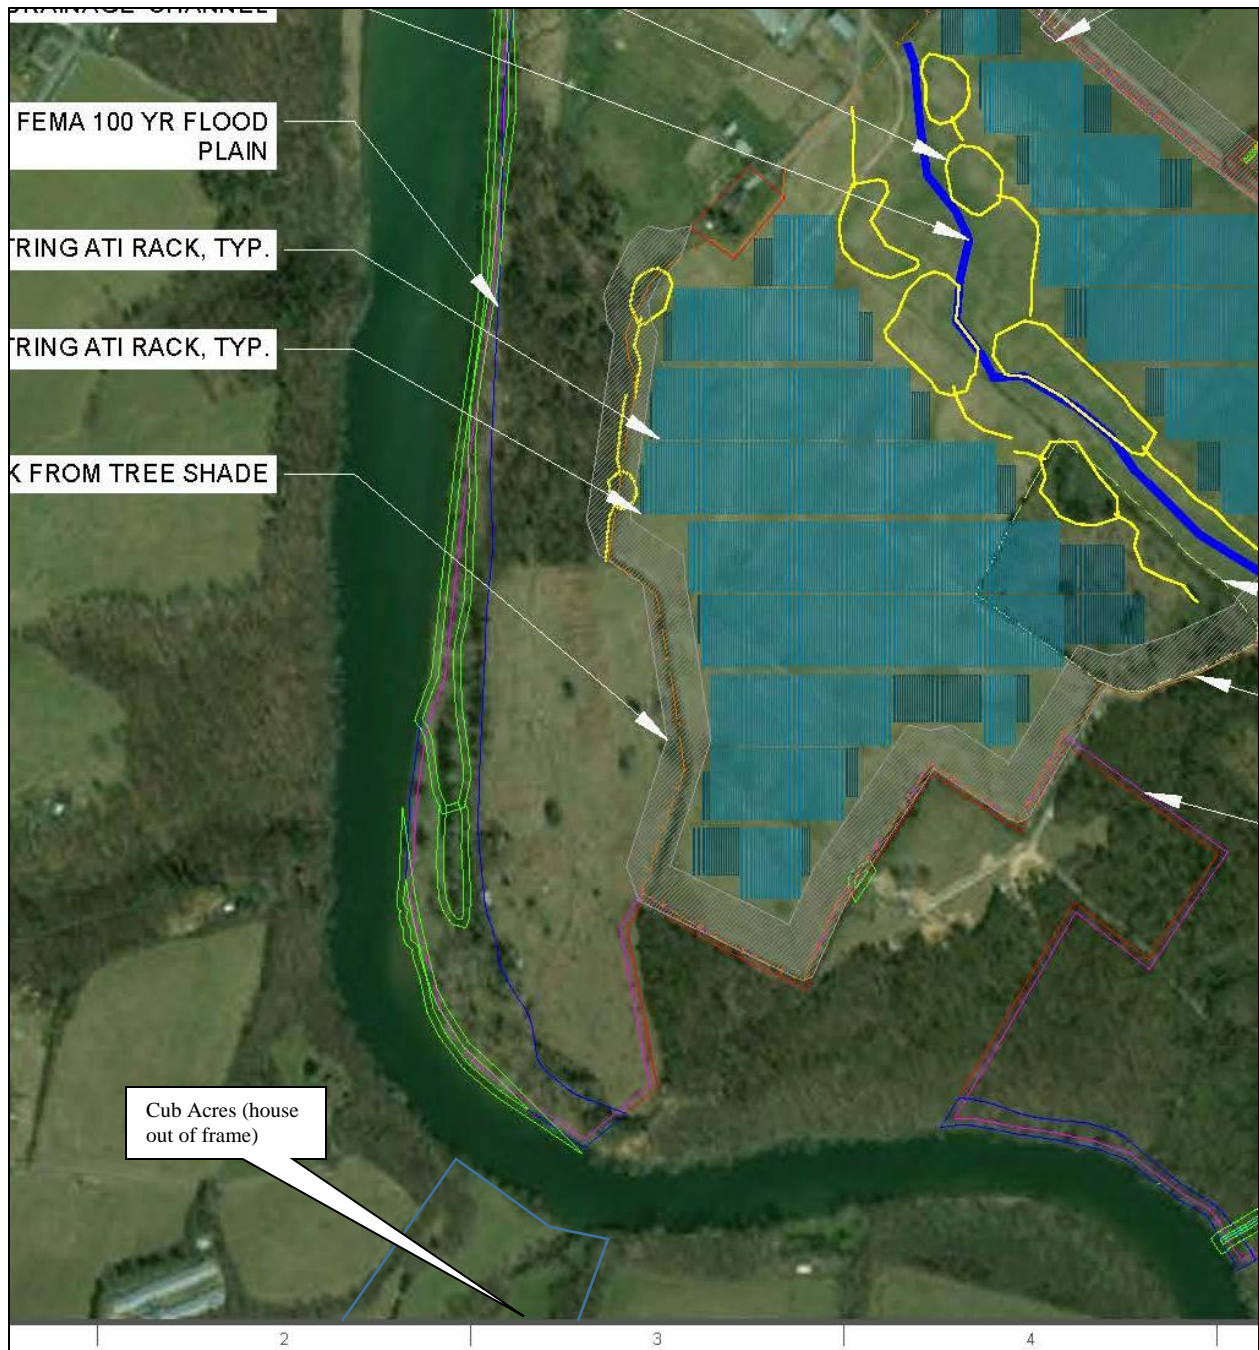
Detail of conceptual site plan illustrating improvement setback and vegetative screening in the vicinity of Cub Acres. Source: Urban Grid
